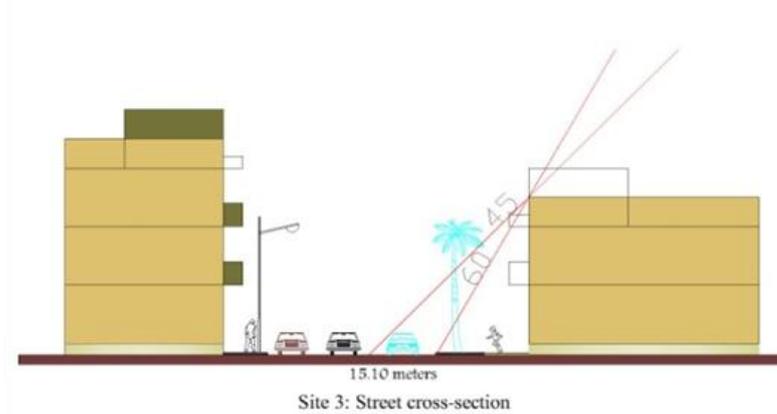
12: Street Cross-section, Site Three - El-Mukhtar-I
